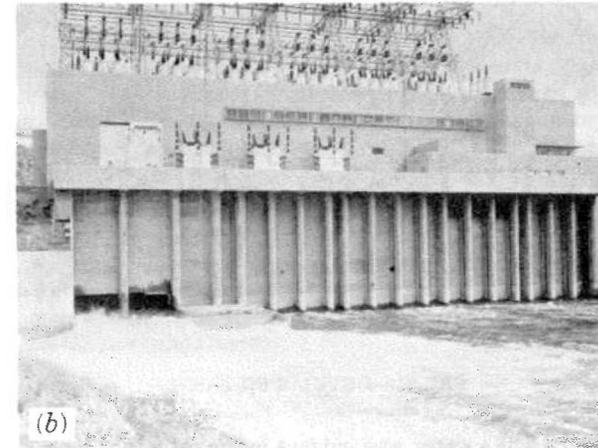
MEXICAN OUTLET WORKS - FALCON
